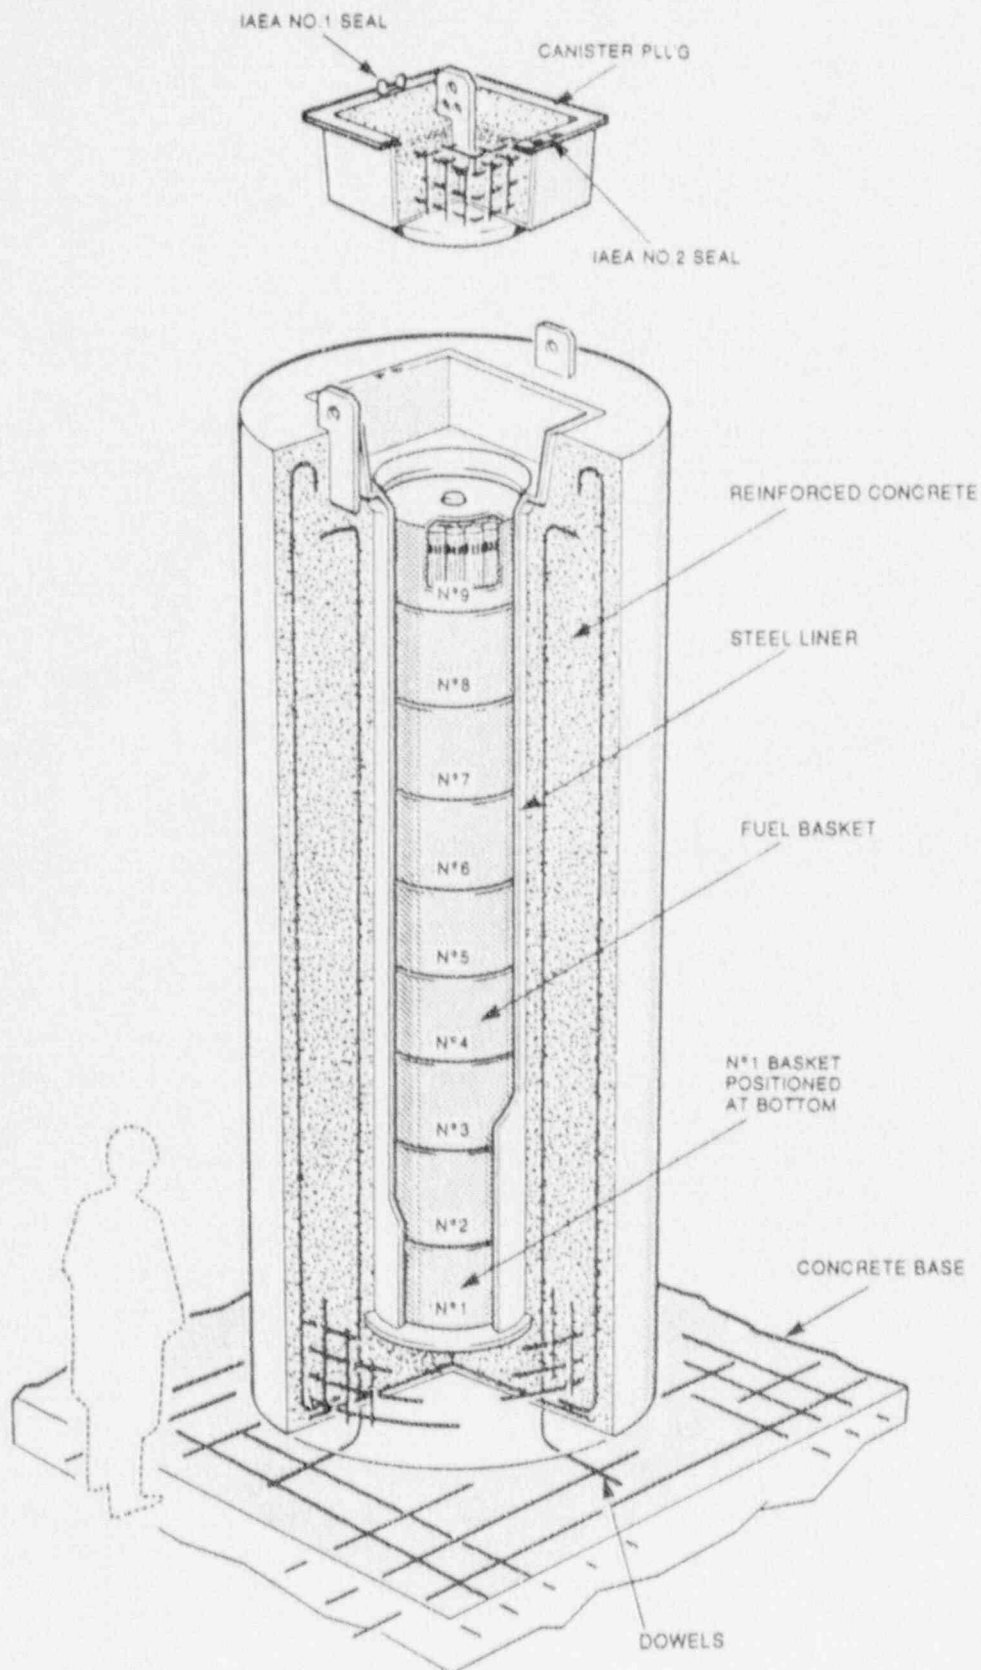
INTERIM DRY STORAGE CONCRETE CANISTER
